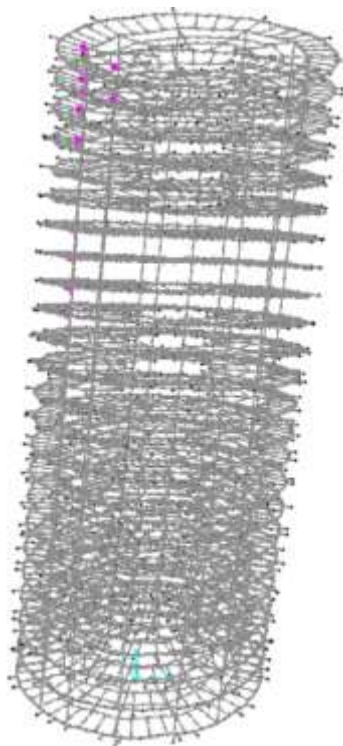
Plastic hinges in the steel elements for a roof displacement of 1 m
